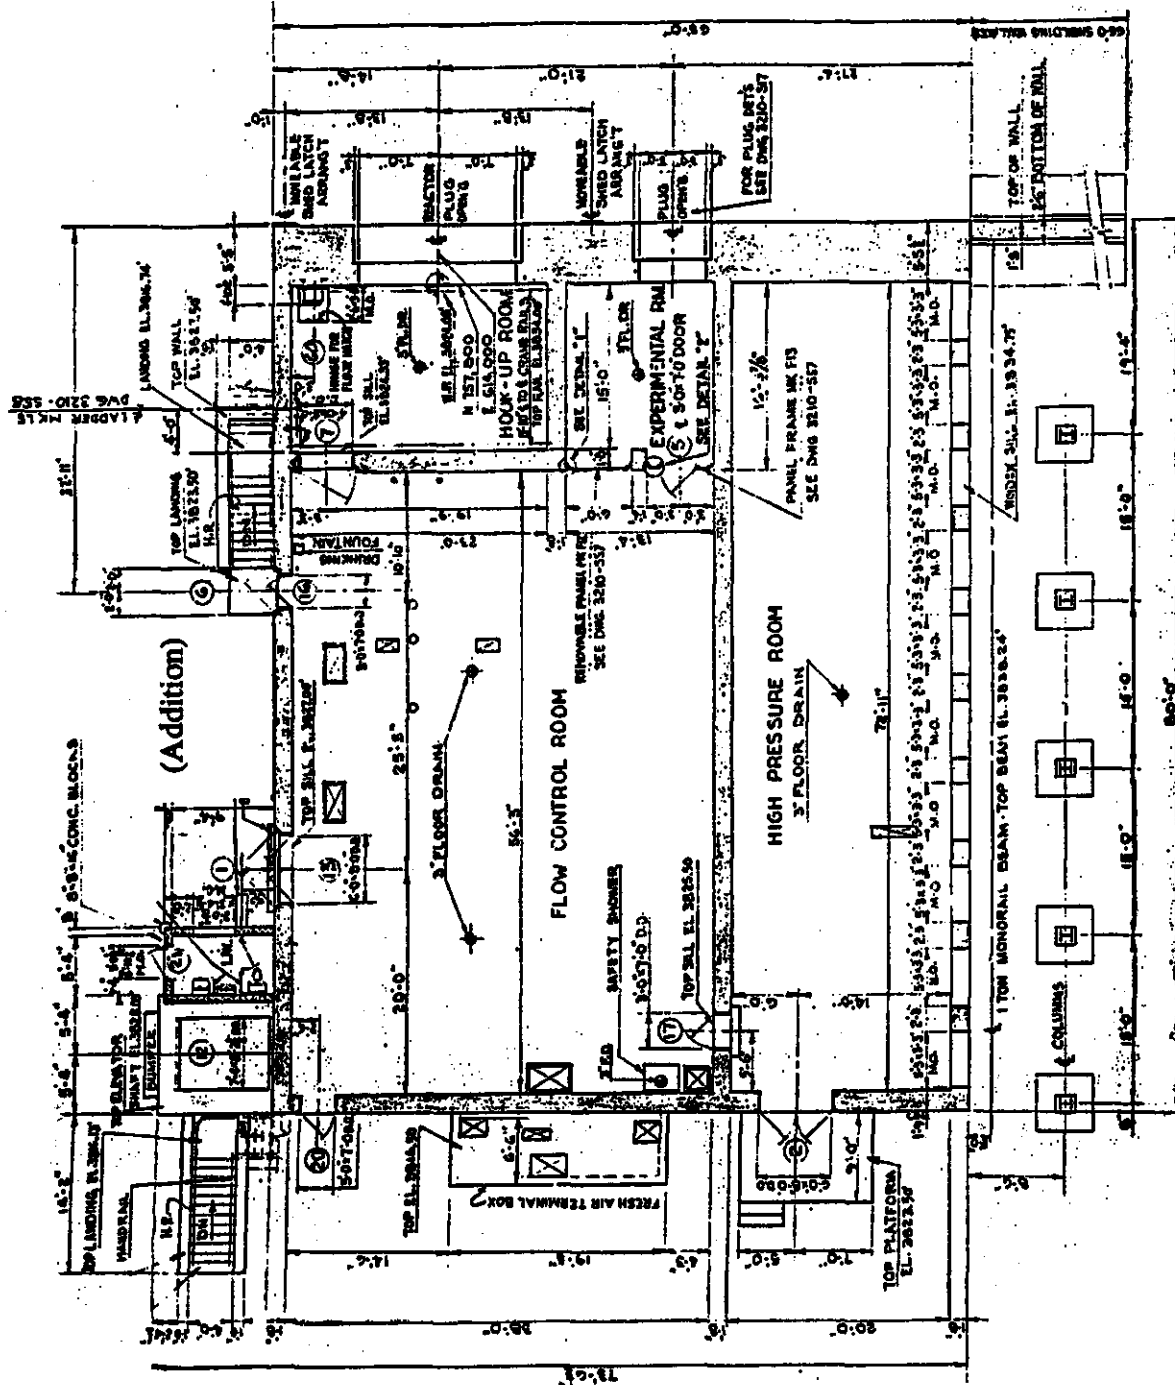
Test Cell C, Building 3210, Floor 1 plan, ca. 1960.
